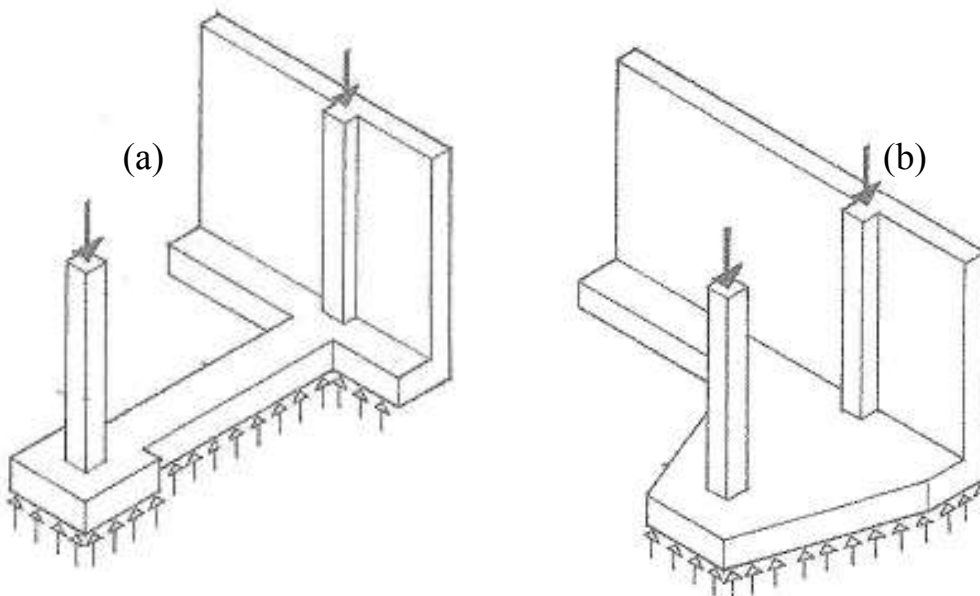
(a) A Cantilever footing, (b) A cantilever and combined footing
